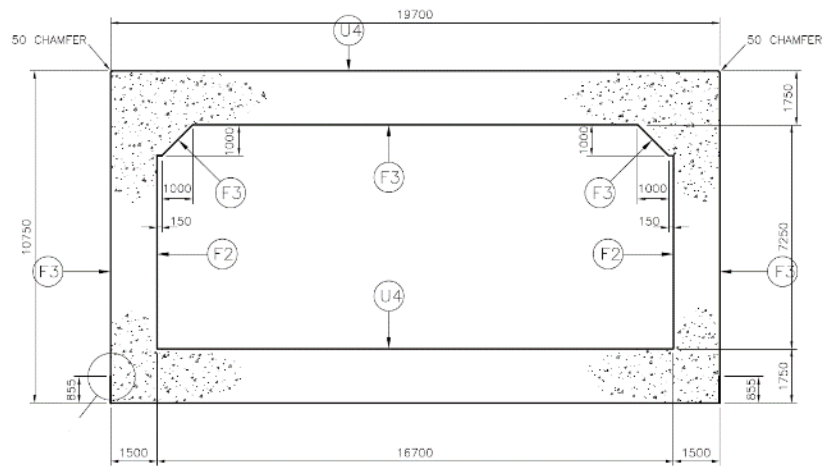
Typical concrete box section (extracted from drawing no. SD 5044-4)
